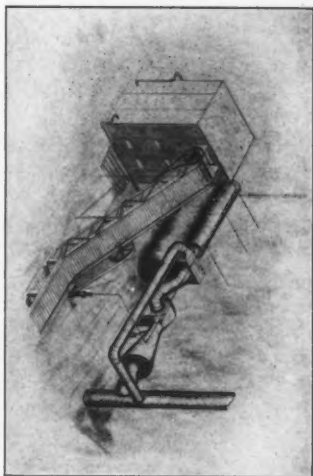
INCINERATING PLANT, FOR LIGHT REFUSE, EAST EIGHTEENTH STREET, NEW YORK CITY.
